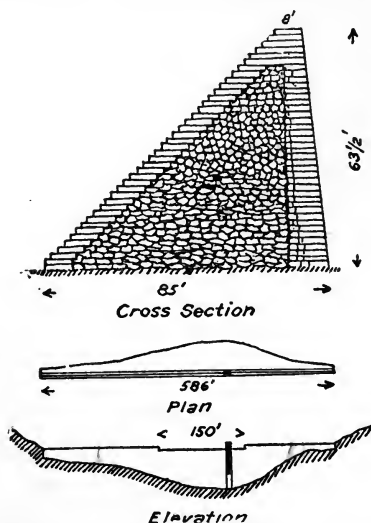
ELEVATION, PLAN, AND CROSS-SECTION OF CASTLEWOOD DAM.
